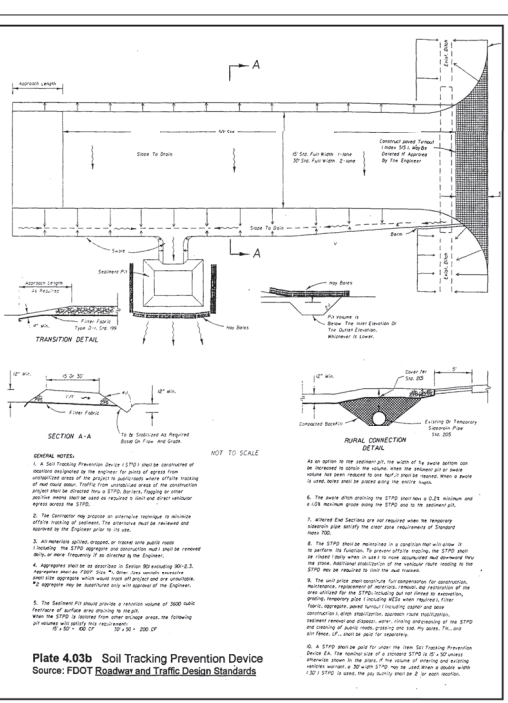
Soil Tracking Prevention Device Shows: FDOT Roadway and Traffic Design Standards
